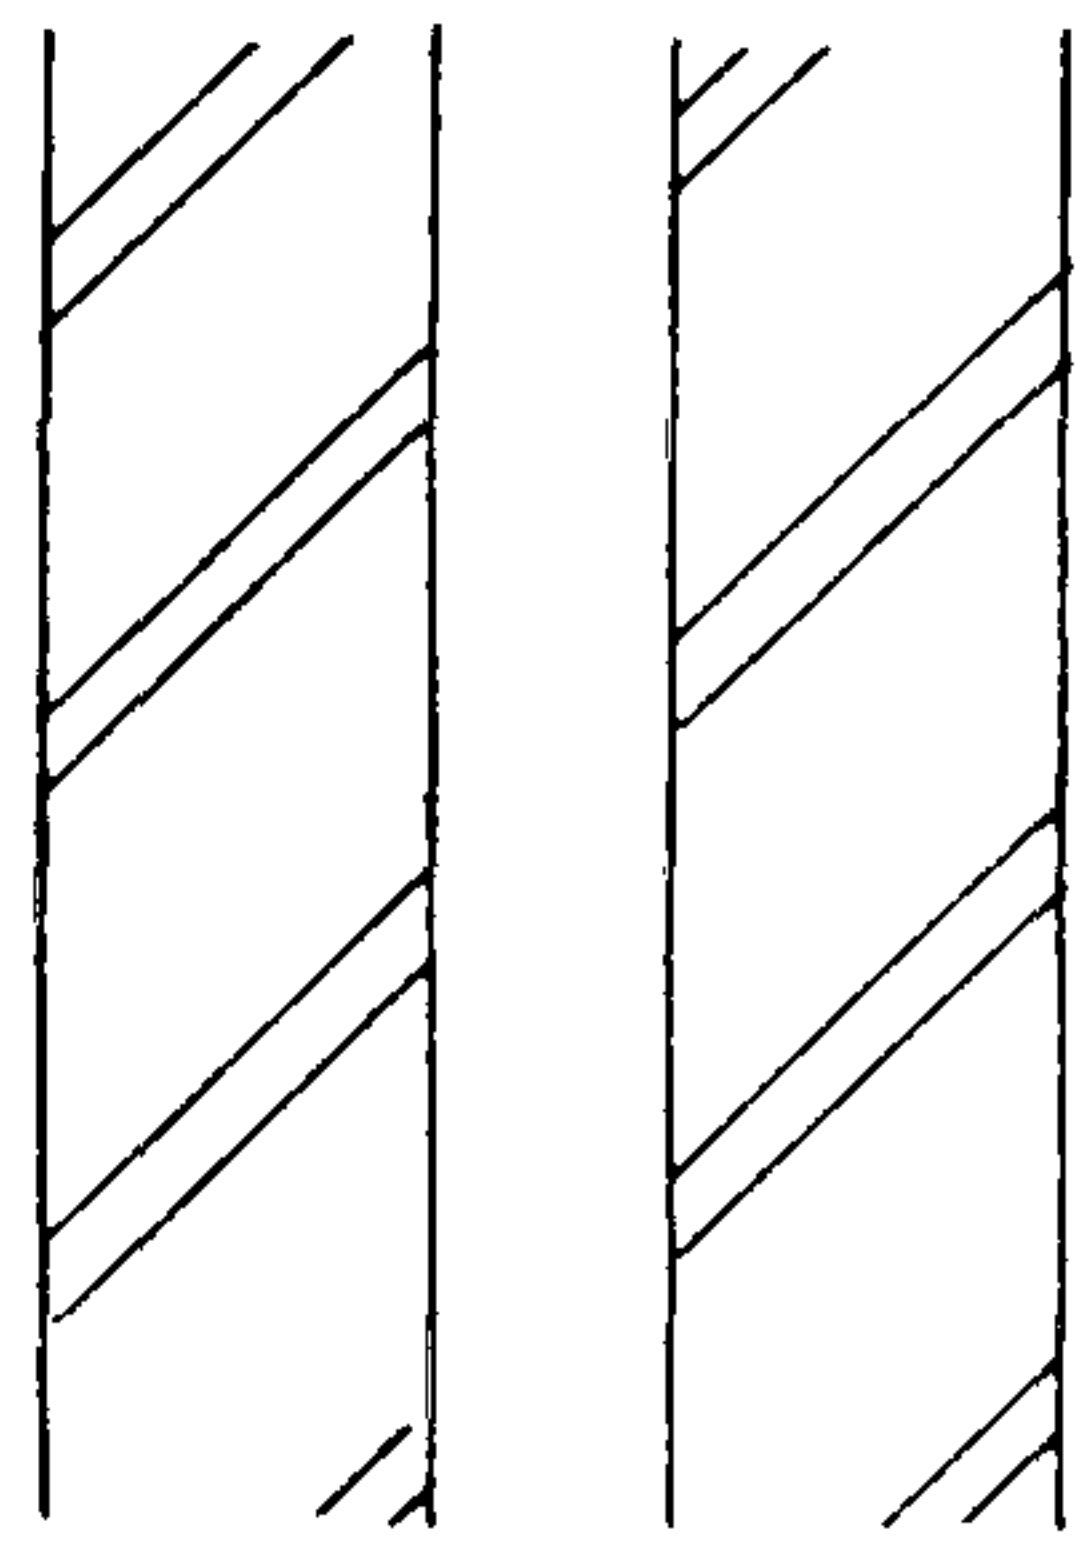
CAVITY BRICK WALL: UNGLAZED
